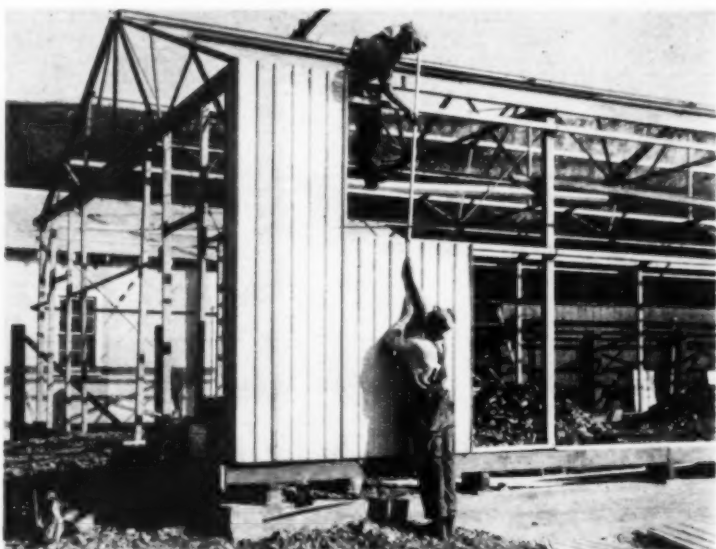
8:15 A. M., SECOND DAY—Placing of metal wall panels begins, starting with corner sheet. Worker on top is placing interlocking cap section to join adjacent panels.
